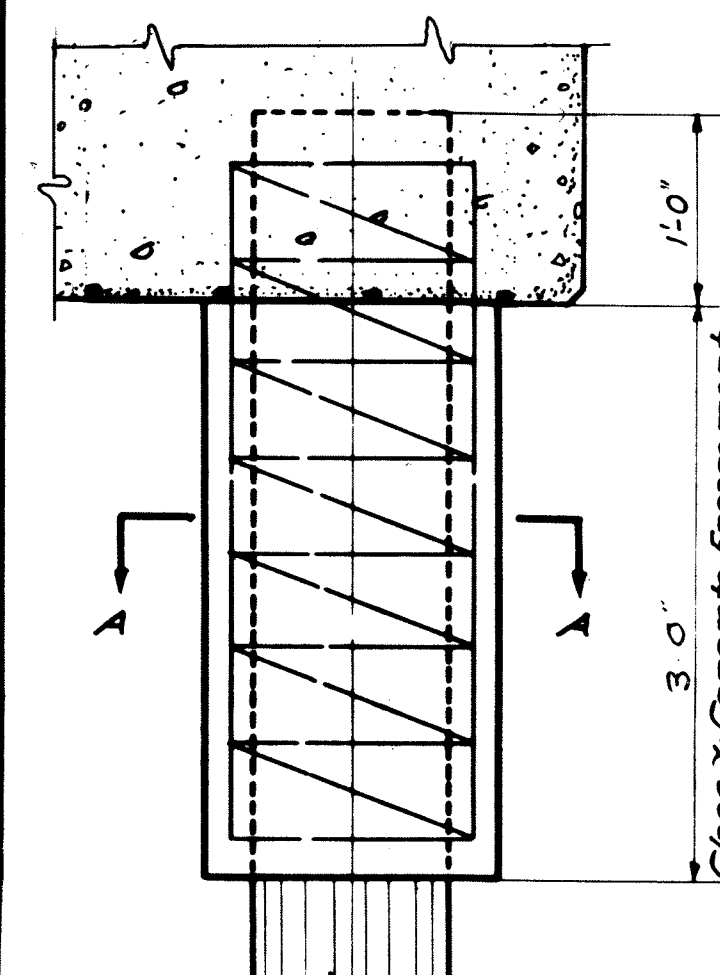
DETAIL OF SPIRALLY WELDED STEEL SHELL FOR CAST IN PLACE CONCRETE PILES
